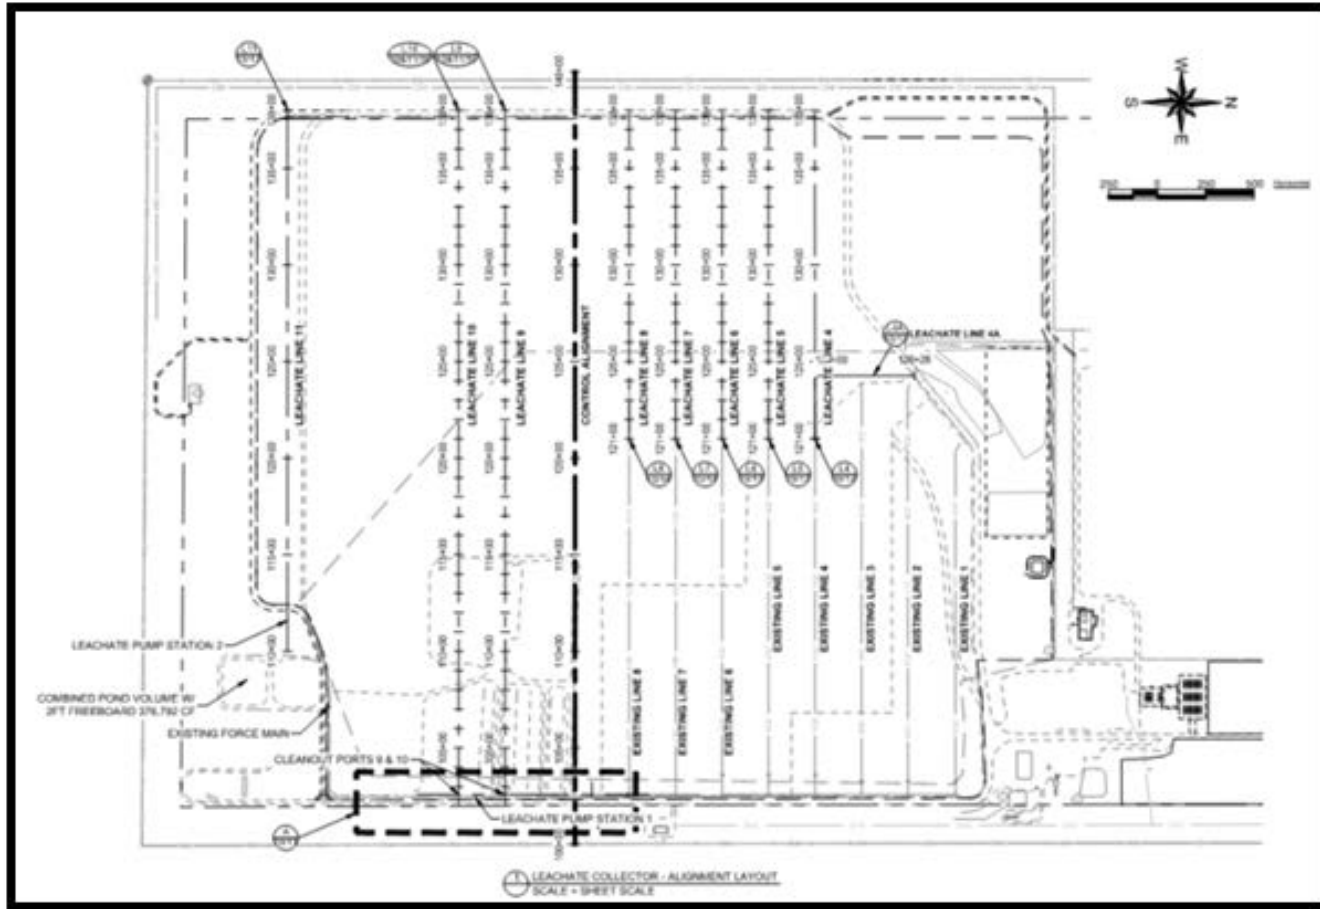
shows the leachate collection system as proposed to IDEQ in the Tentative Design Plan.
